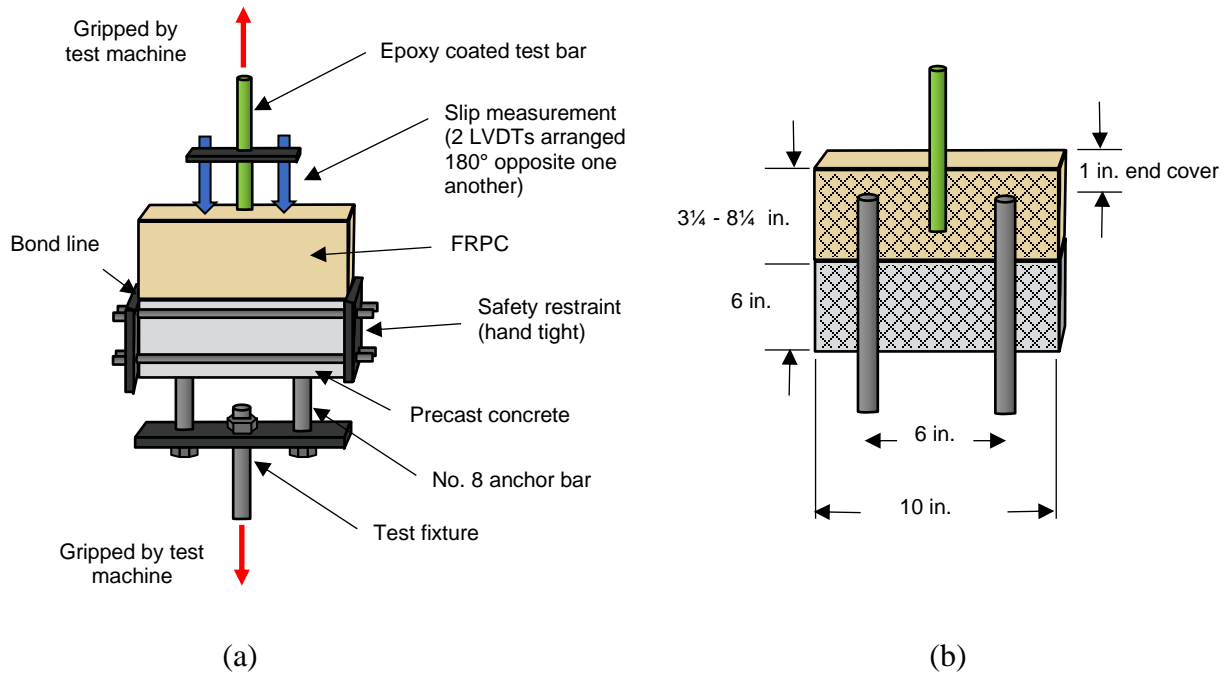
Splice specimen test details: (a) test setup, (a) specimen geometry
